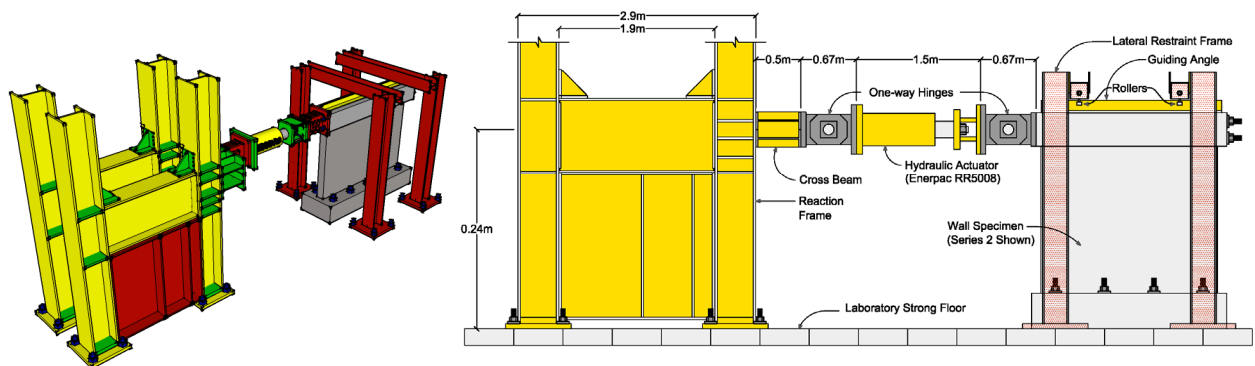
Typical laboratory test setup (W2 wall specimen shown).
